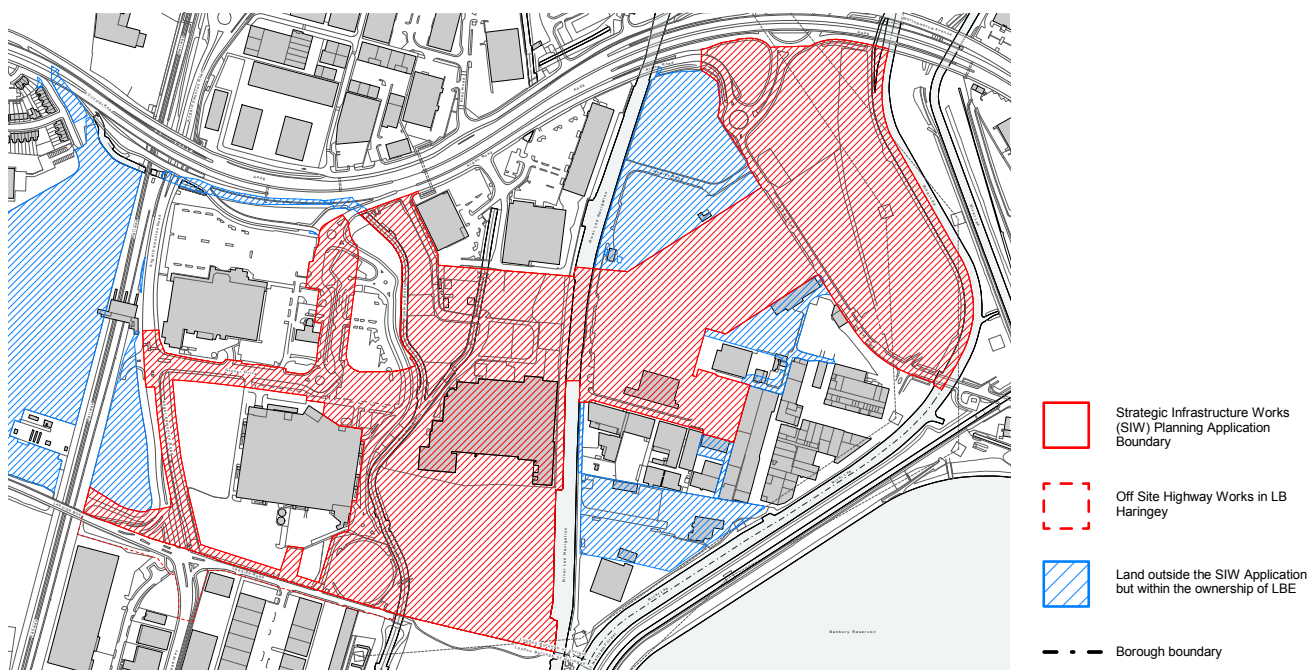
Strategic Infrastructure Works Detailed Planning Application boundary
